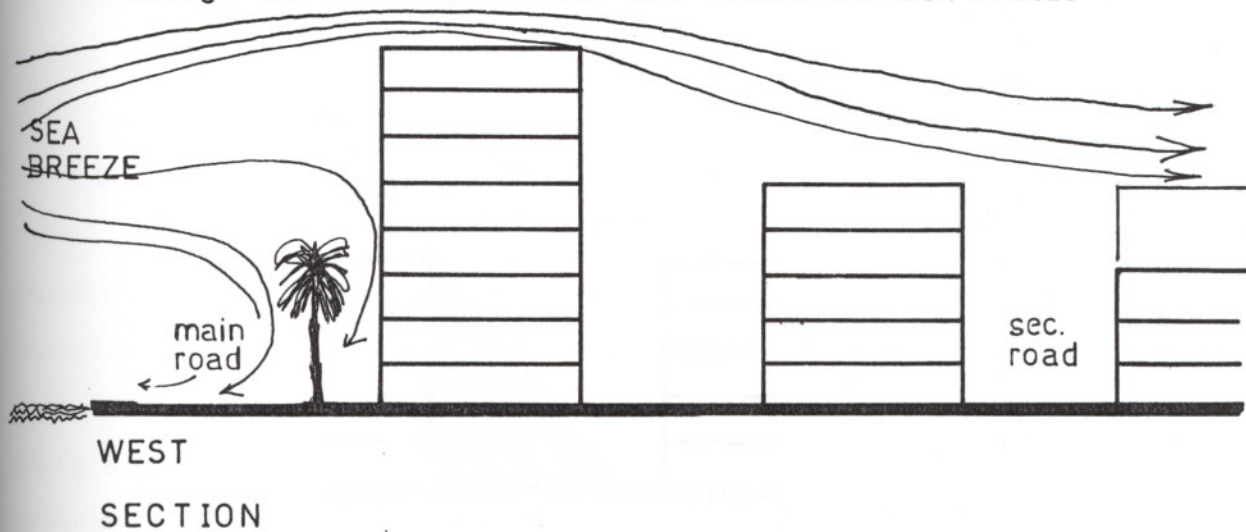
Orientation to the sun and to the prevailing wind should be considered while determining building heights.
